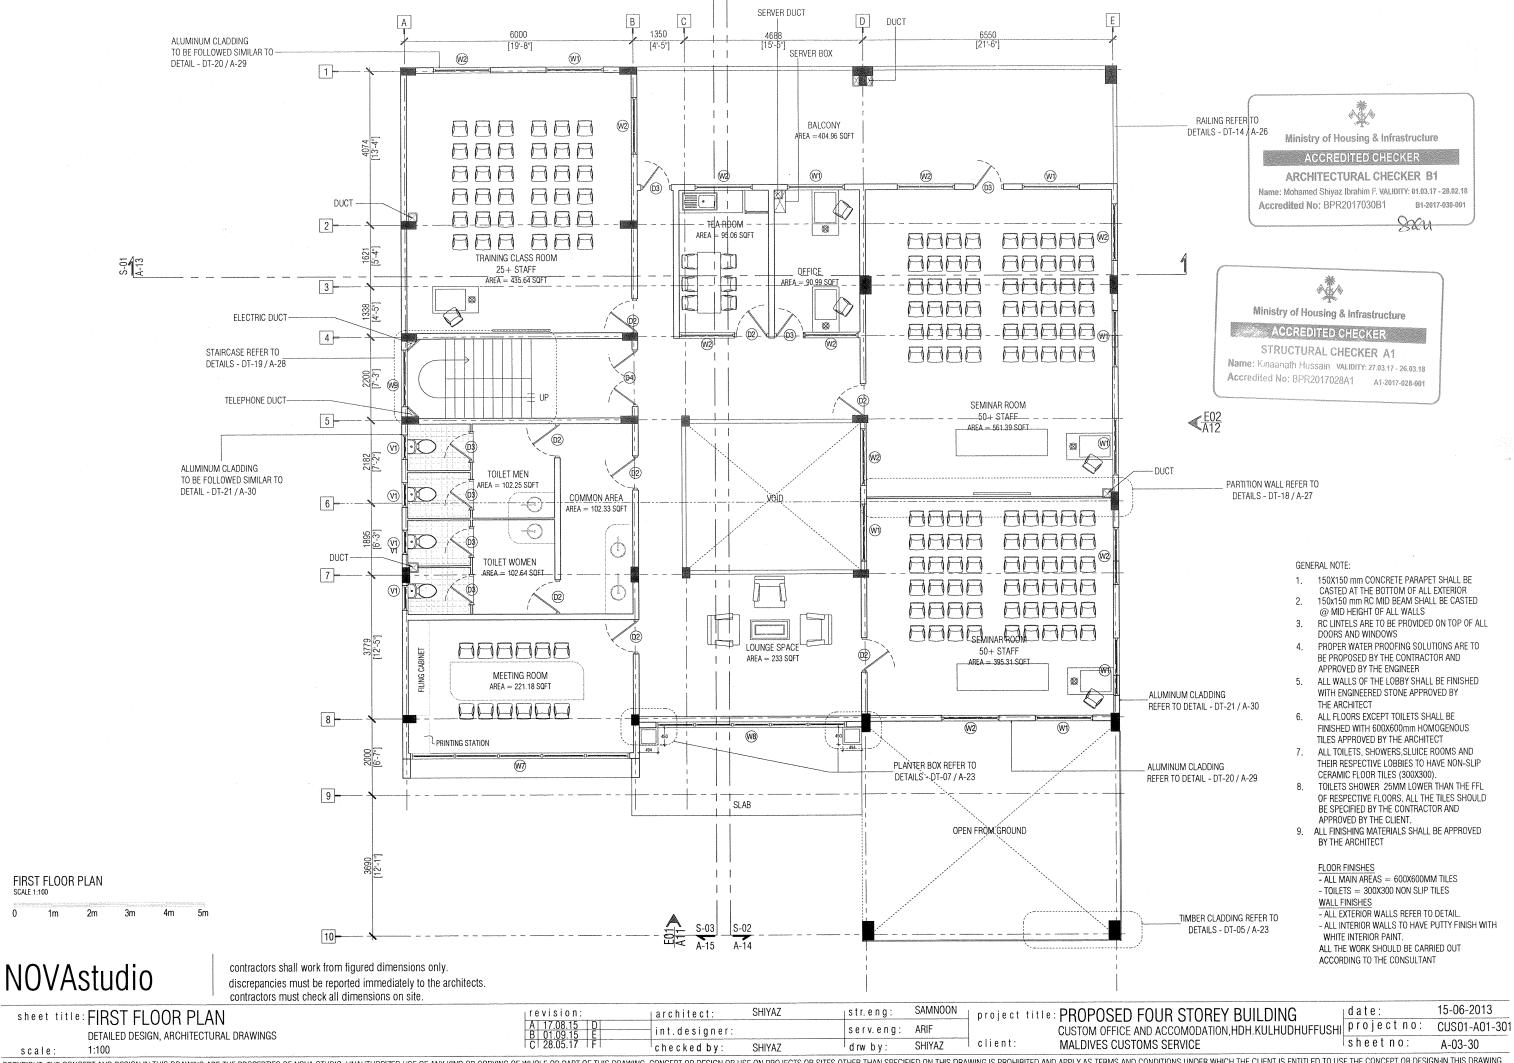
DETAILED DESIGN, ARCHITECTURAL DRAWINGS
